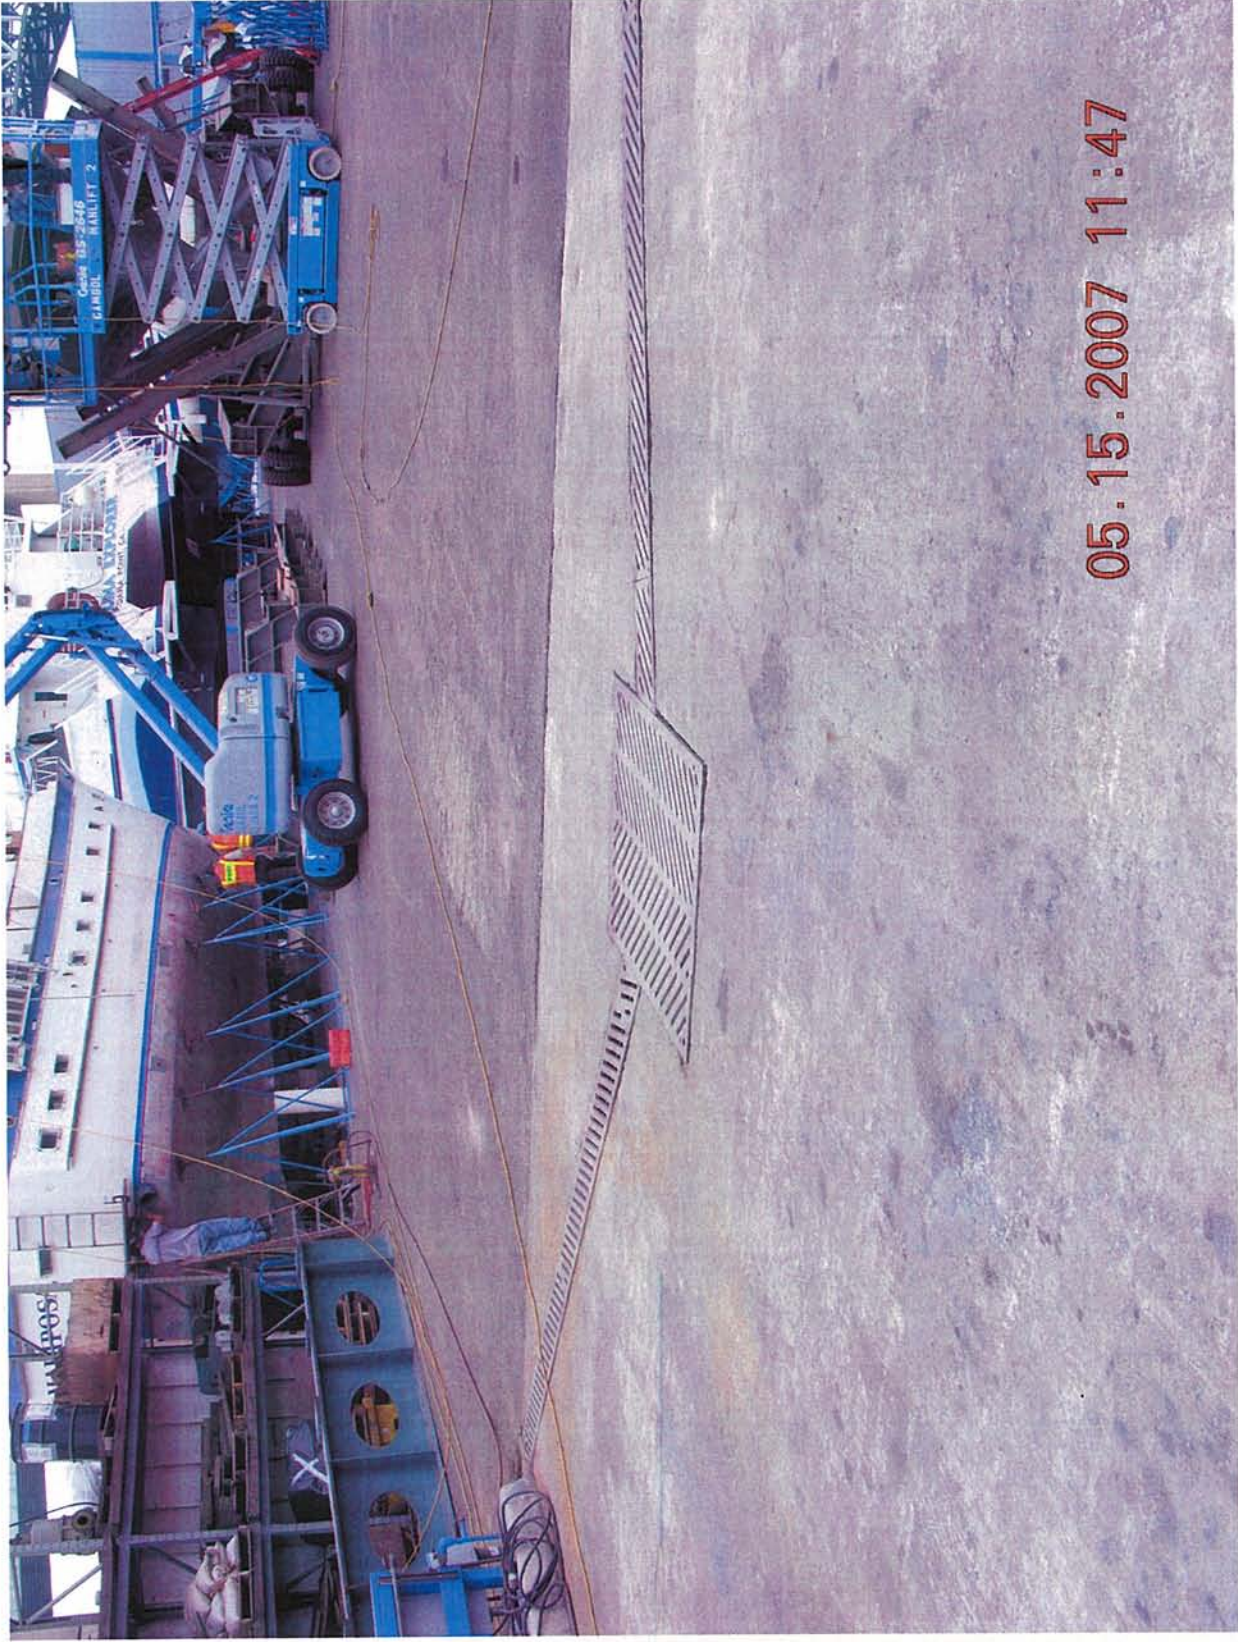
The trench/storm drain inlet from the boat ramp (the boat lift is behind the photographer) looking toward the northern repair area.
